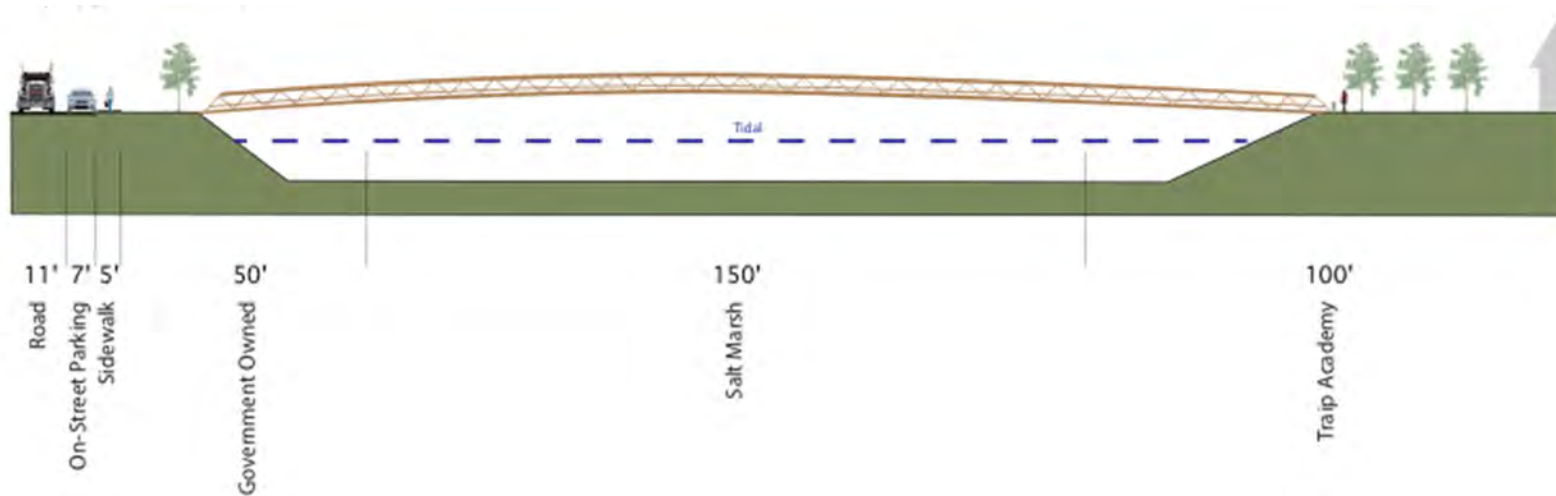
Proposed Reconstruction of the Historic Footbridge between the Greenway and Traip Academy at the Estuary
